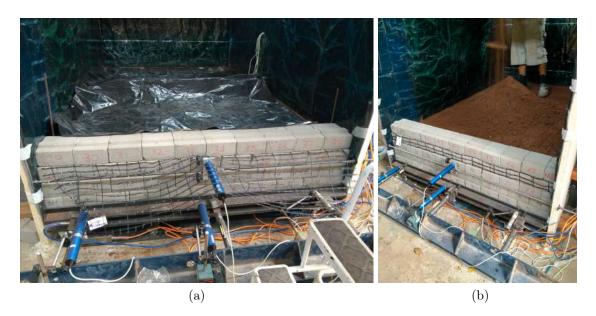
Geogrid connection to the wall facing: (a) before wrapping the reinforcement around the above row of blocks; (b) after wrapping it around.
